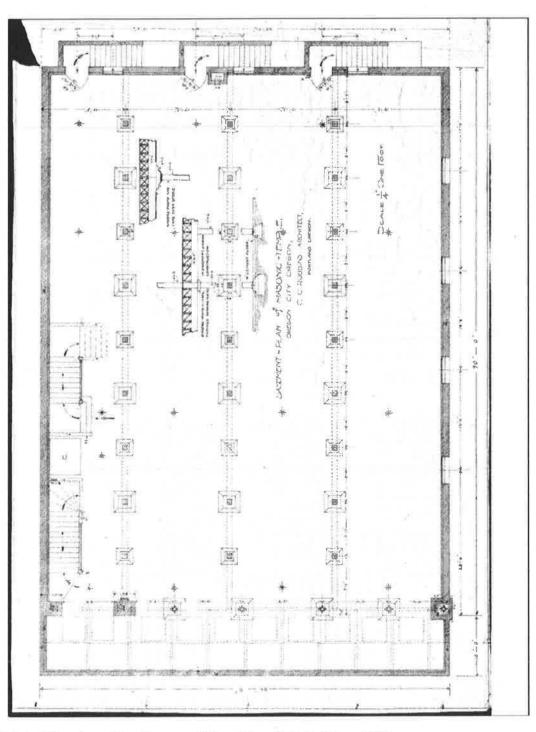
Original Drawing of the Basement Floor Plan, C.C. Robbins, 1907.
